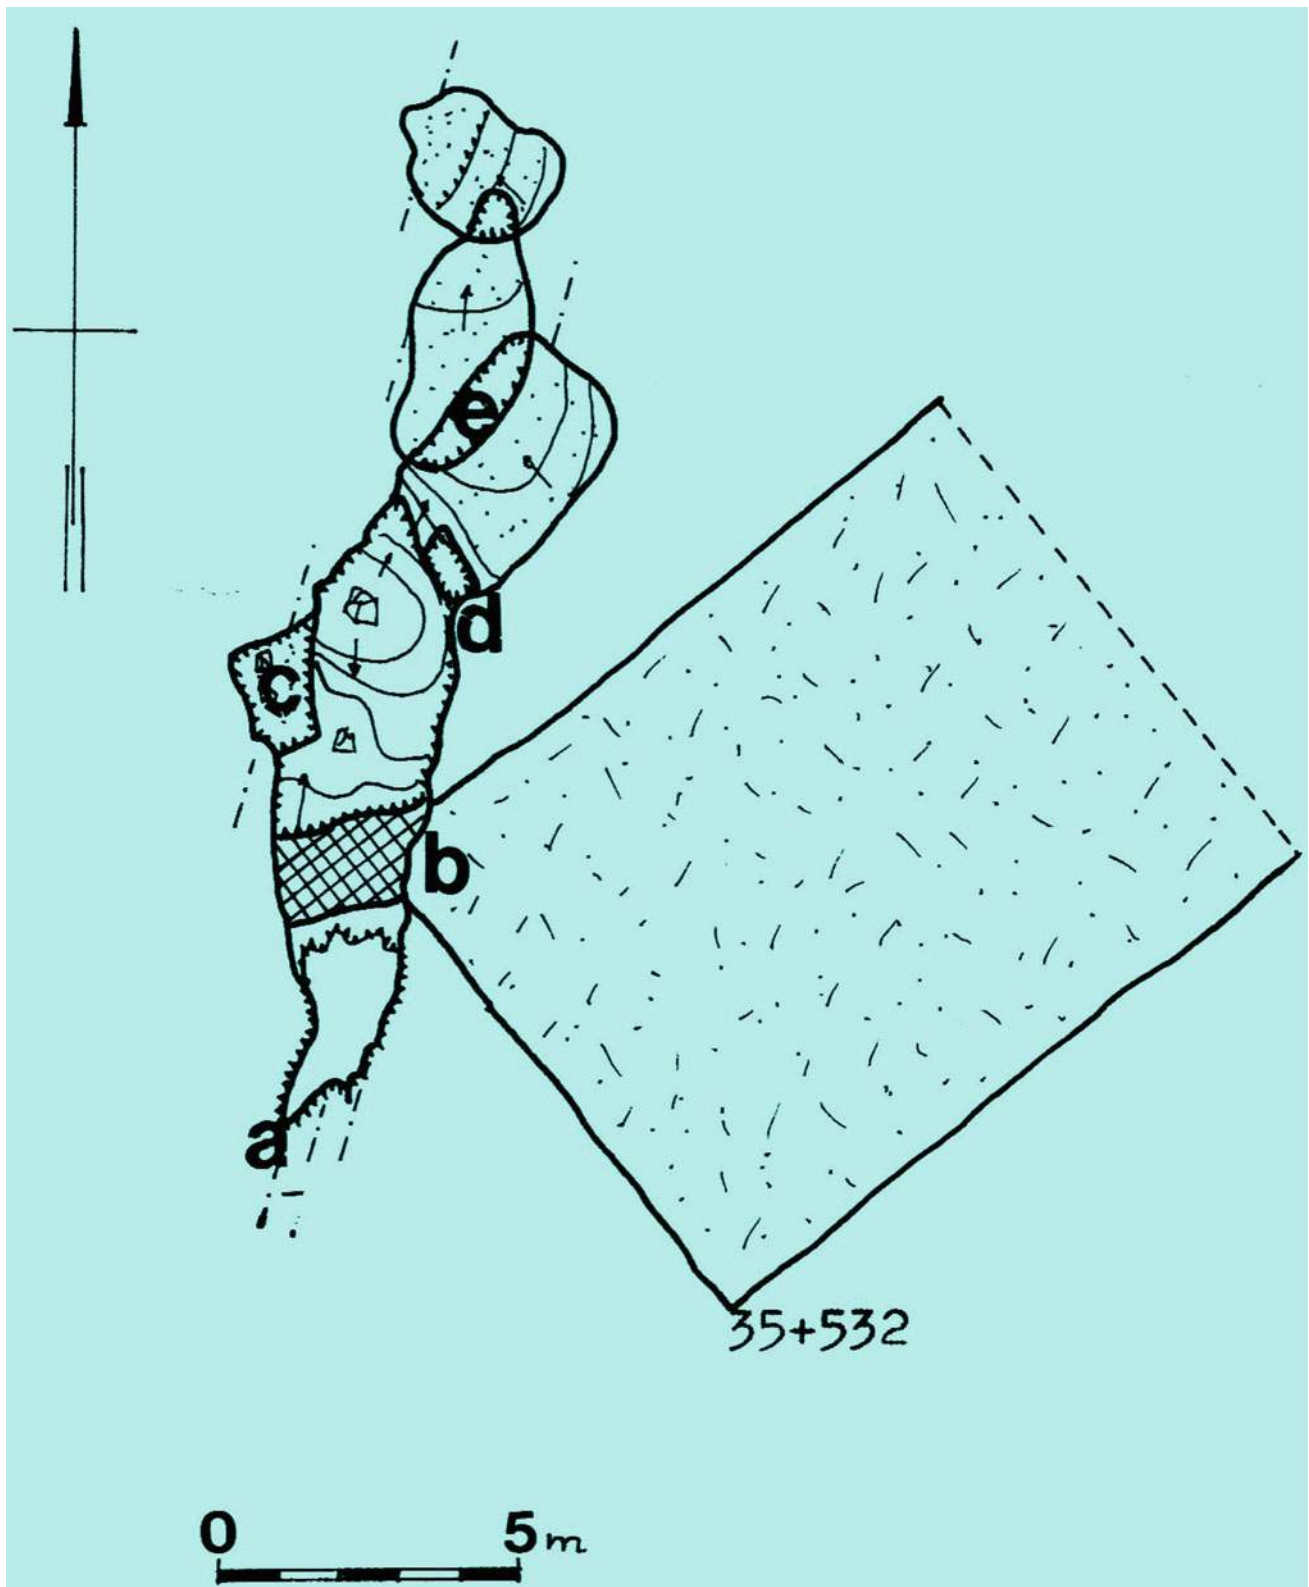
Plan of cavern at km 35 + 532 in Sleme Tunnel
